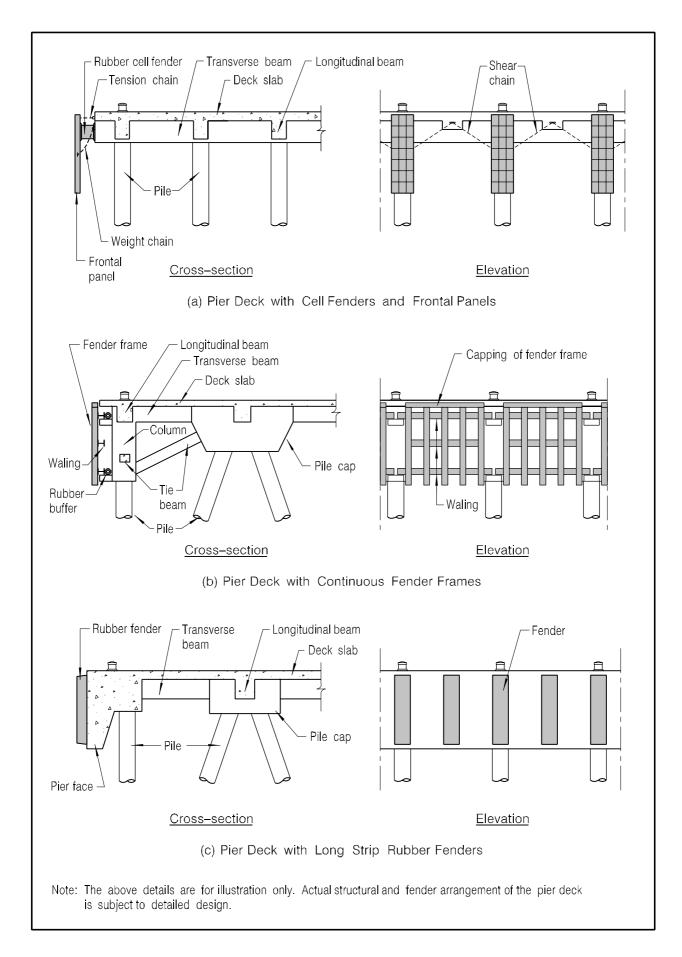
Cross-section of Reinforced Concrete Piled Deck Pier
